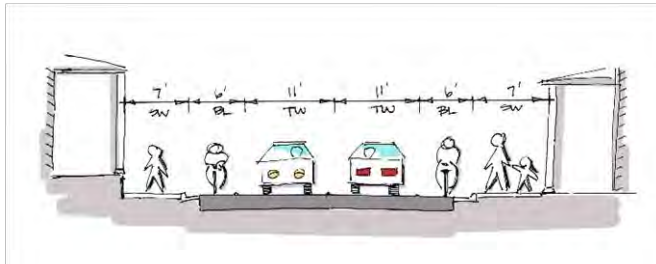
Diamond Springs Enhanced Sidewalks and Bicycle Lanes Cross Section and Rendering
